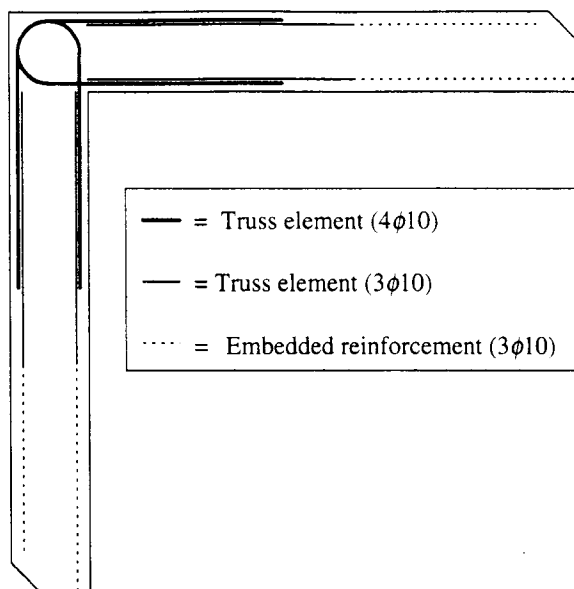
Modelling of the reinforcement bars in the frame corner with new reinforcement detailing.
